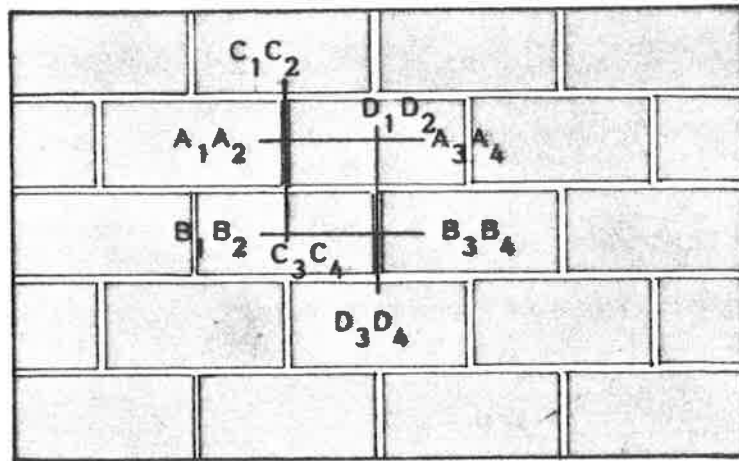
(a): Elevation of Brickwork in Stretcher Bond
